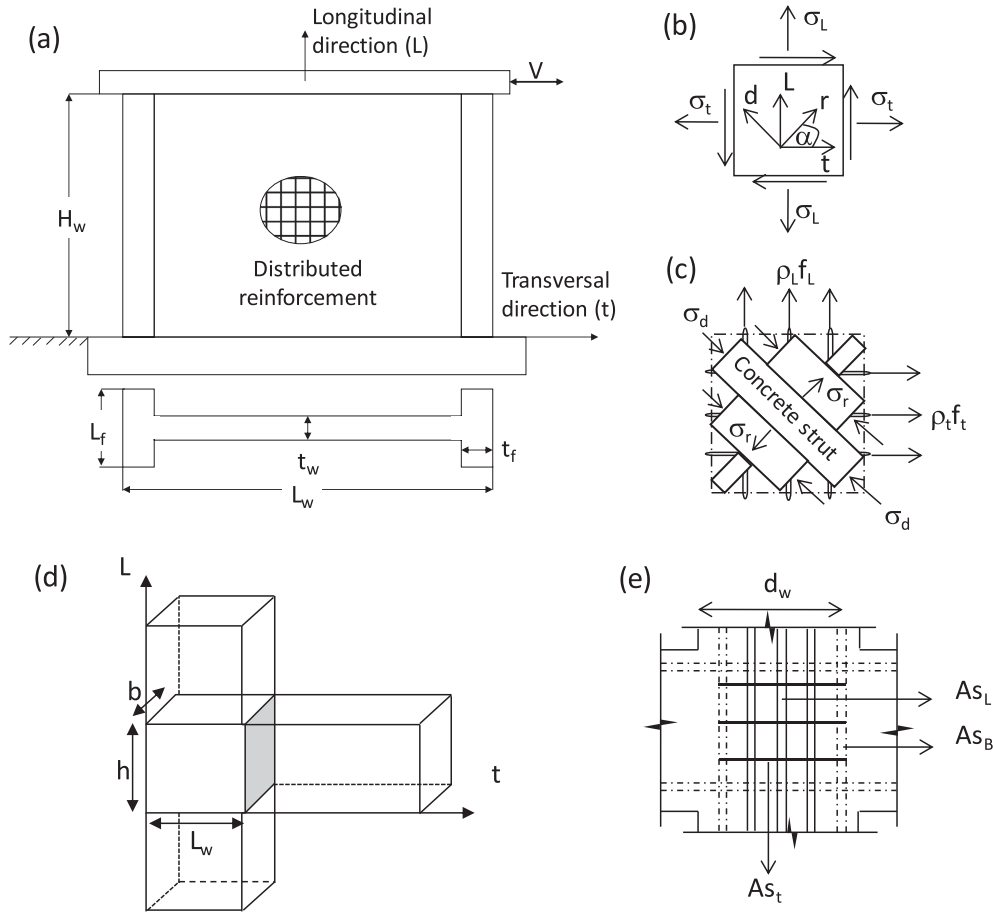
Wall and beam-column joint analogy – (a) short reinforced concrete wall, (b) average stress on wall, (c) compression strut in wall (after [13]), (d) beam-column joint, and (e) joint reinforcement.
